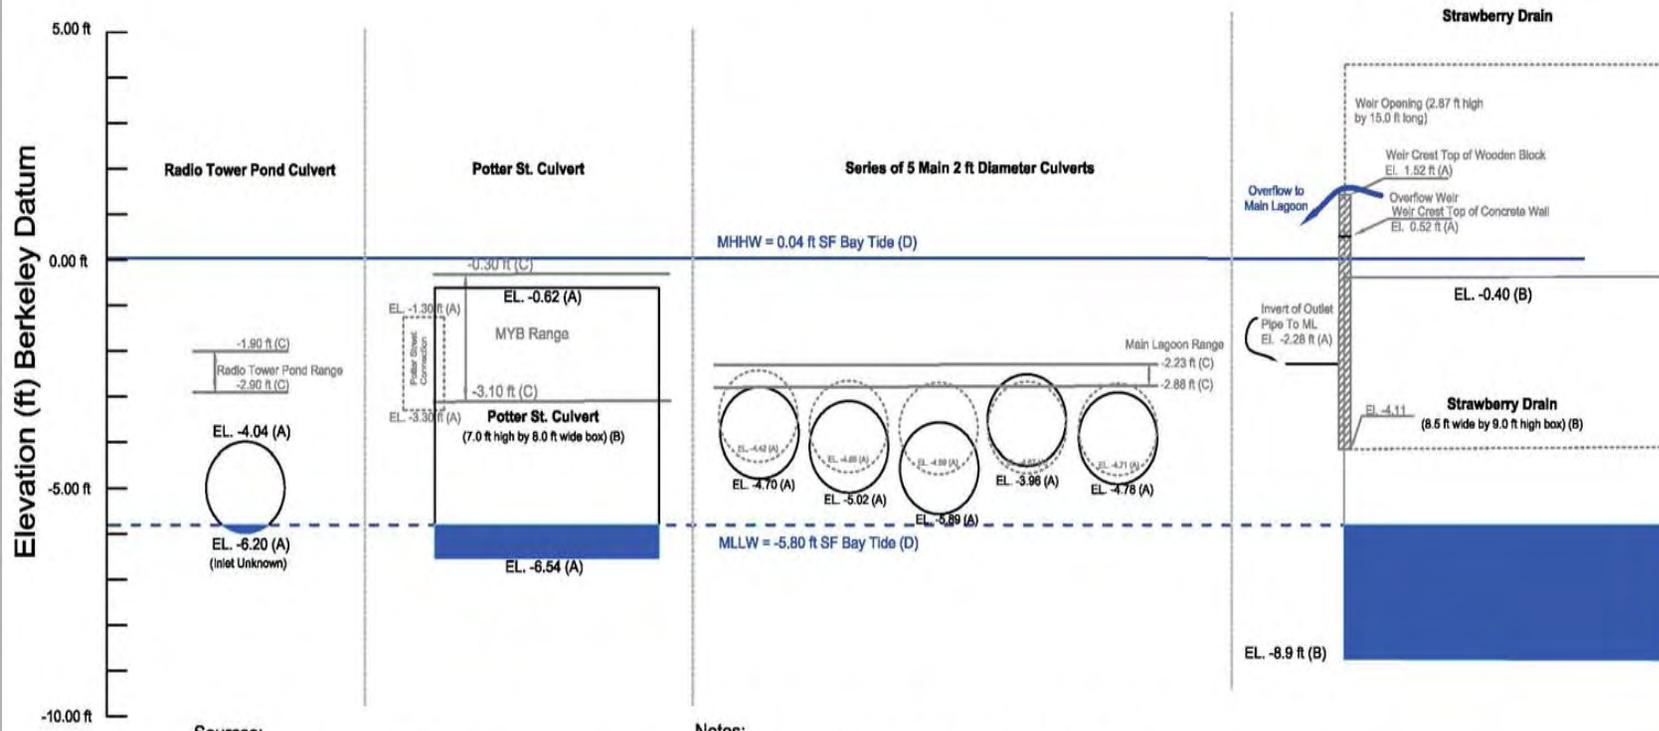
Aquatic Park - Culvert Elevations at Bay Outfall with Tidal Ranges for S.F. Bay and Lagoons
